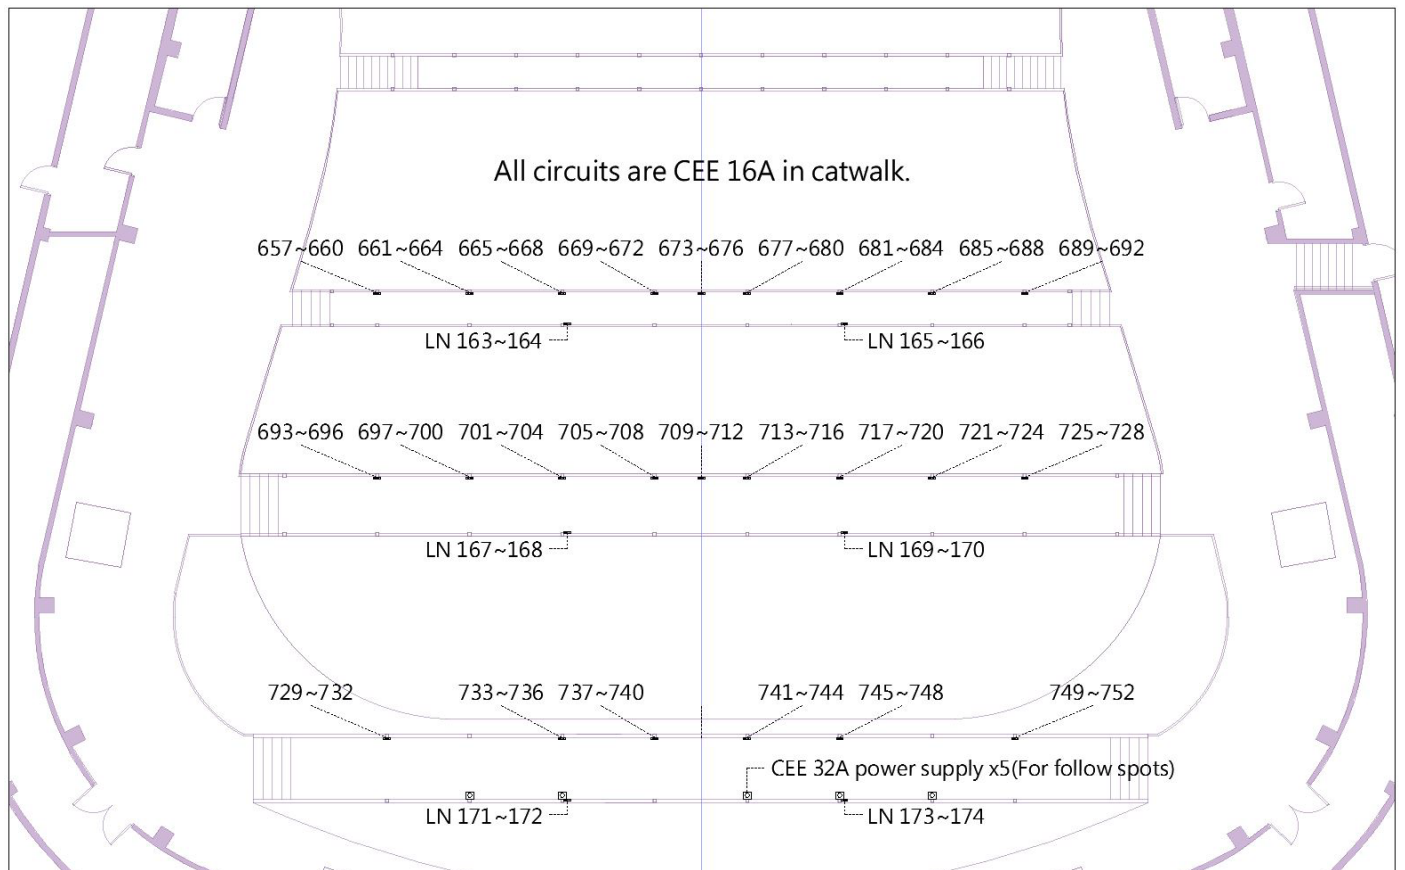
Catwalk Lighting Circuit Layout
